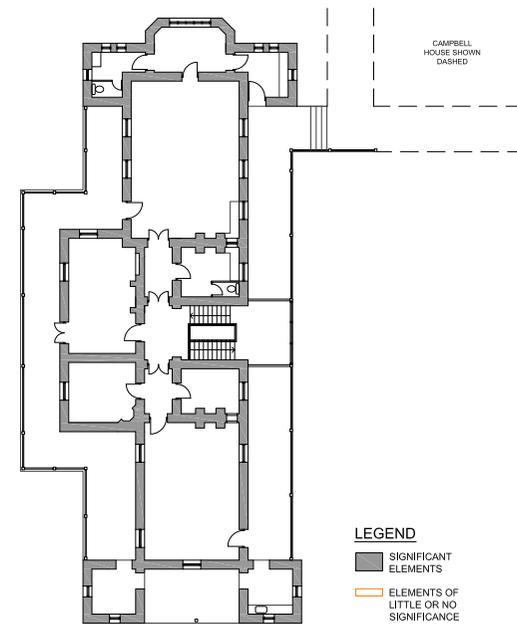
B - VICTORIA HOUSE FIRST FLOOR
